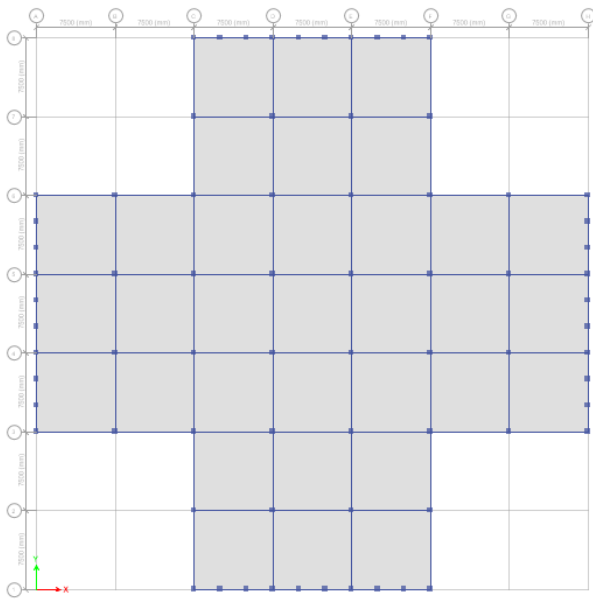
Plan of bundled tube with shear wall i.e. model 4
